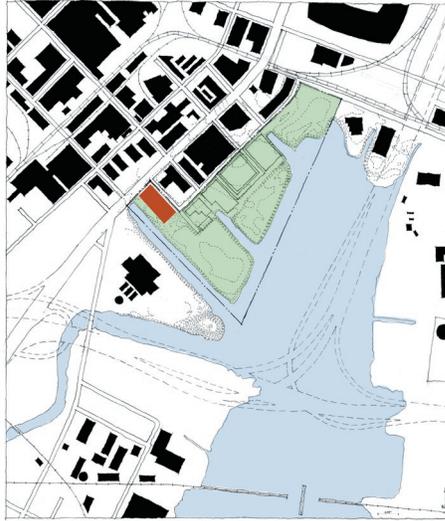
Final Scheme: The building will be placed with in the city block allowing park to remain open
